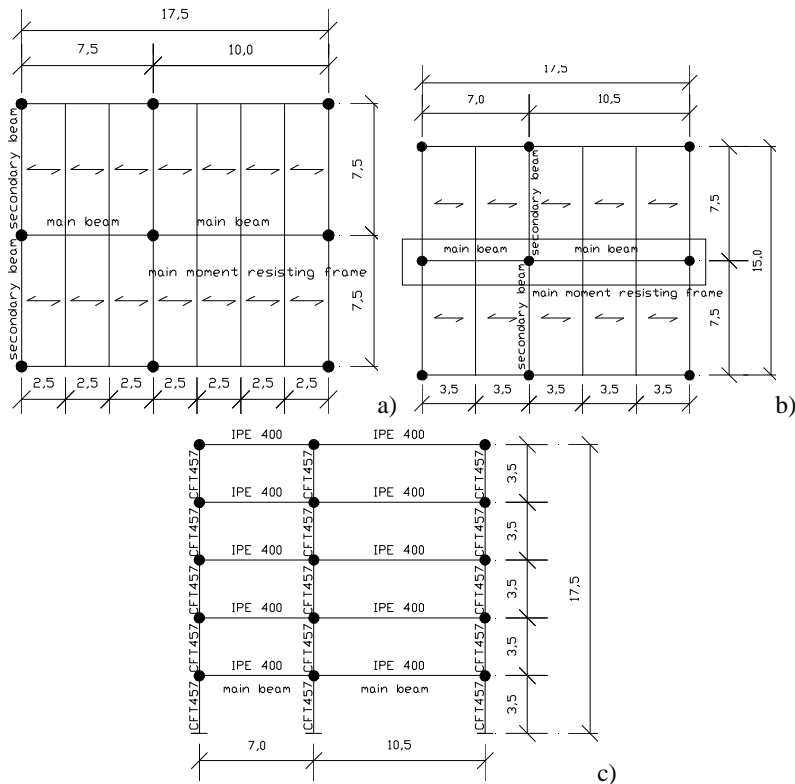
The configuration of building and the longitudinal five-storey MR frame; building endowed with a slab characterized by a) profiled ribbed steel sheeting; b) prefabricated lattice girder; c) frame elevation.
